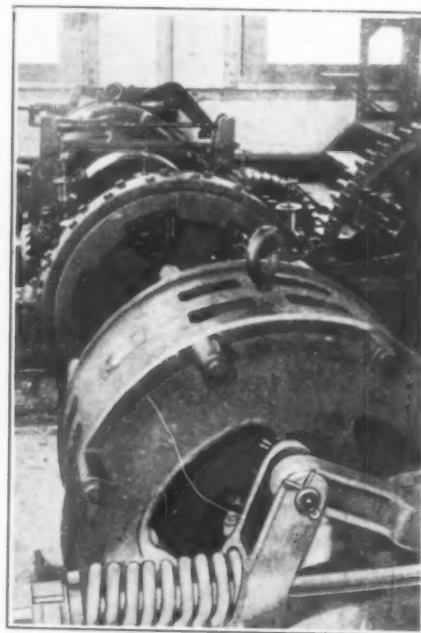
MOTORS AND BRAKE SHAFT OF BRIDGE SHOWN IN FIG. 1
